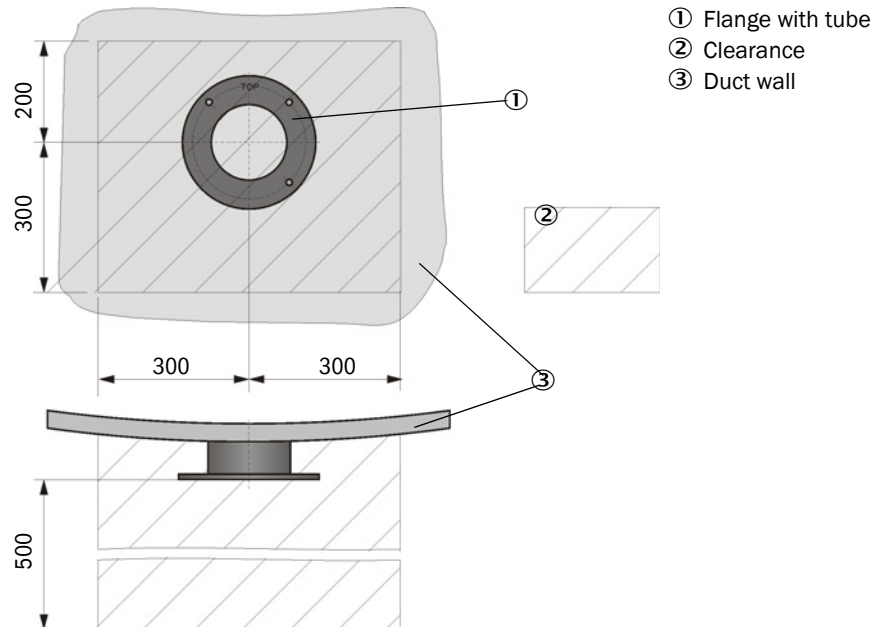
Clearance for sender/receiver unit (dimensions in mm)
